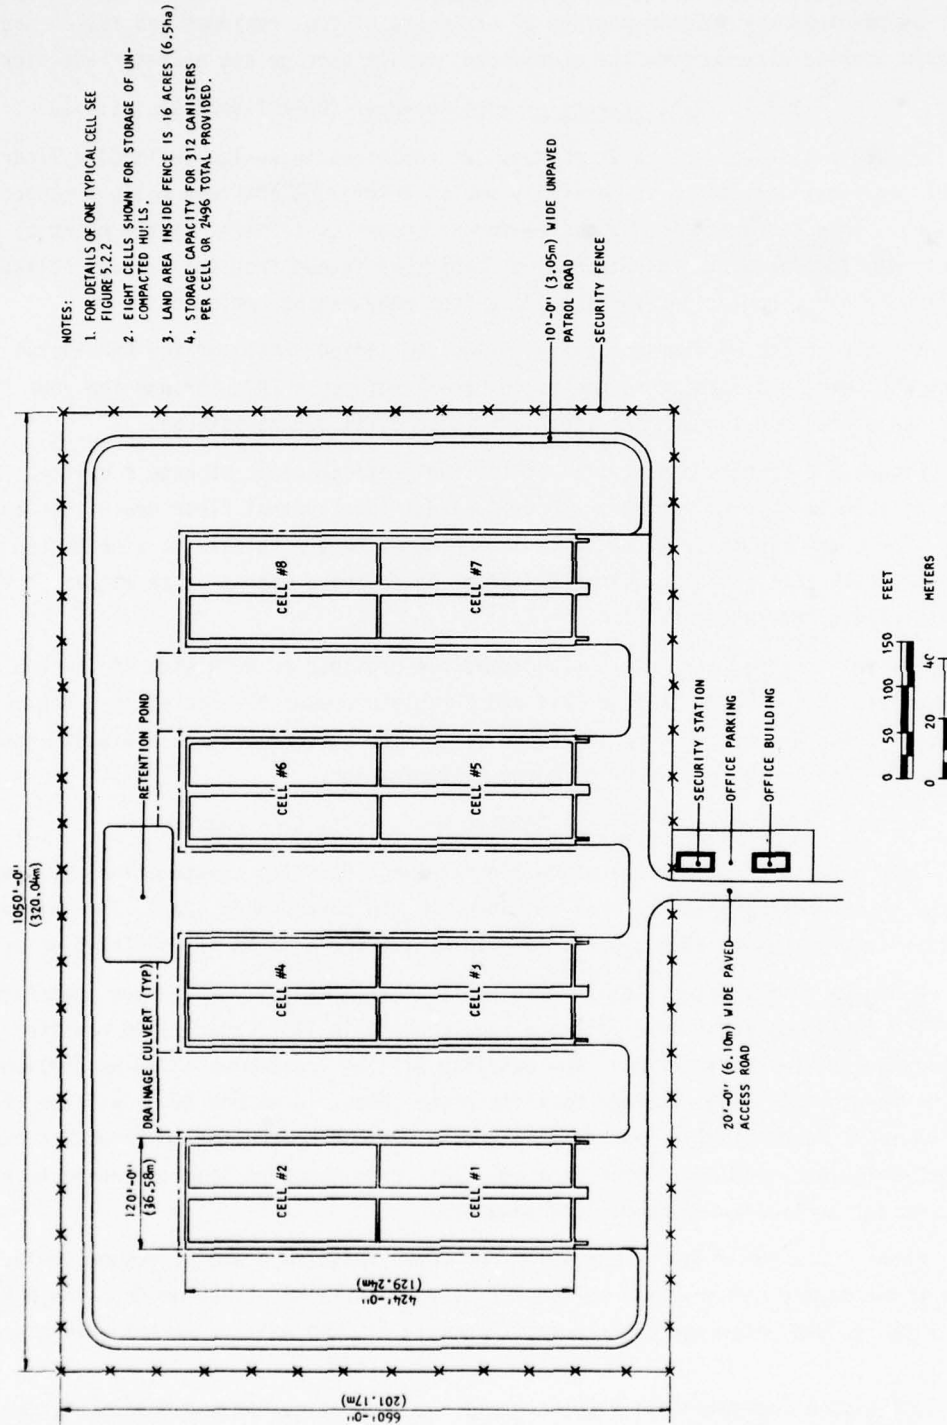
Fuel Residue Vault Storage Facility Plot Plan
